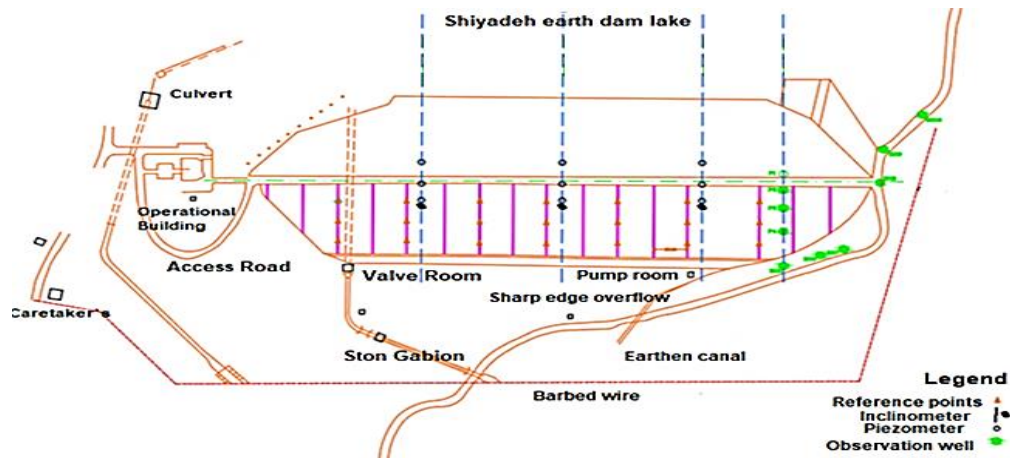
The layout plan of the instrumentation and observation well of the dam
